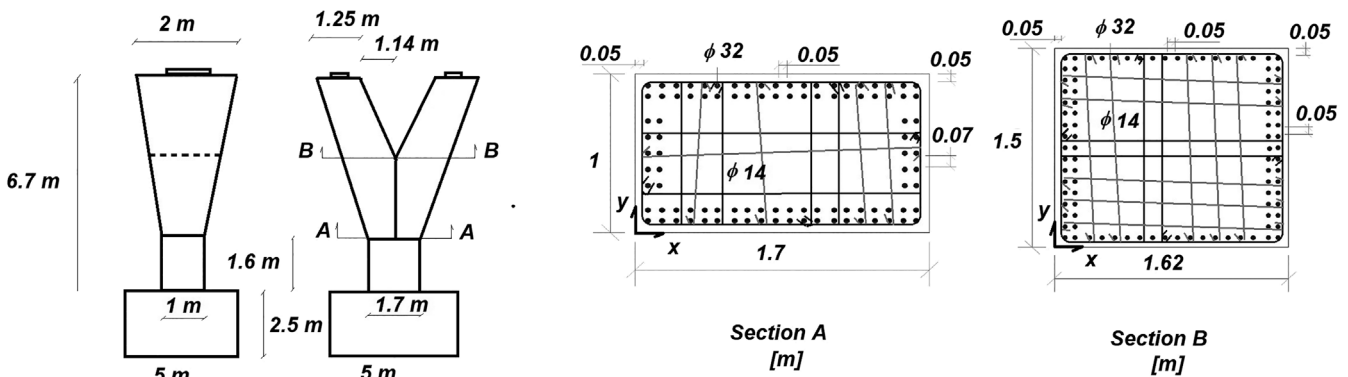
Bridge pier geometry with steel reinforcements details for sections A and B
